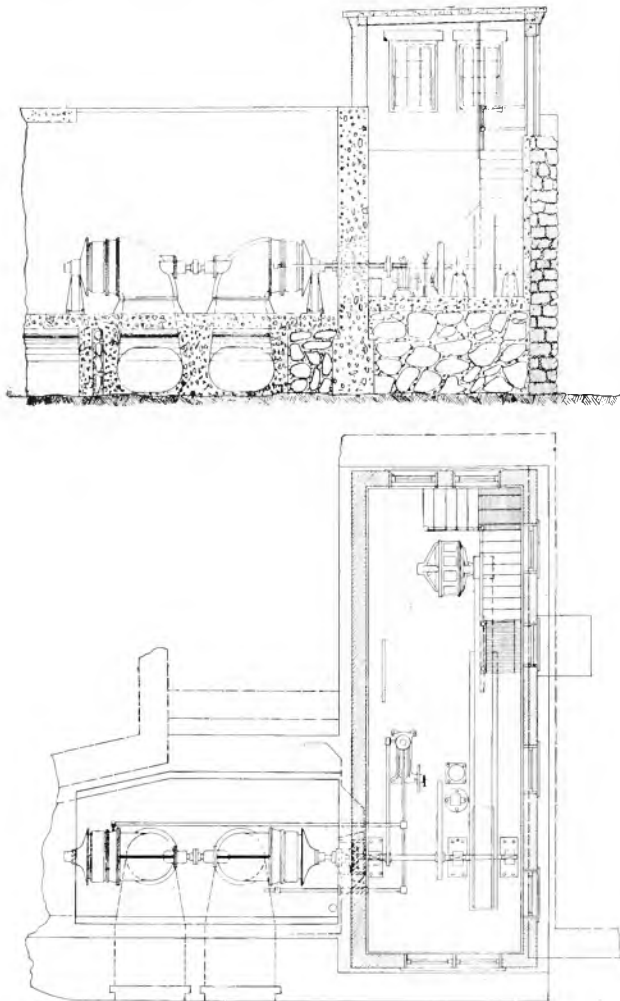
Plan and Elevation of the Green River Induction Generator Plant of the Greenfield Electric Light & Power Co. as Originally Constructed. Protection against floods has necessitated a rearrangement of the plant, involving silent chain drive
